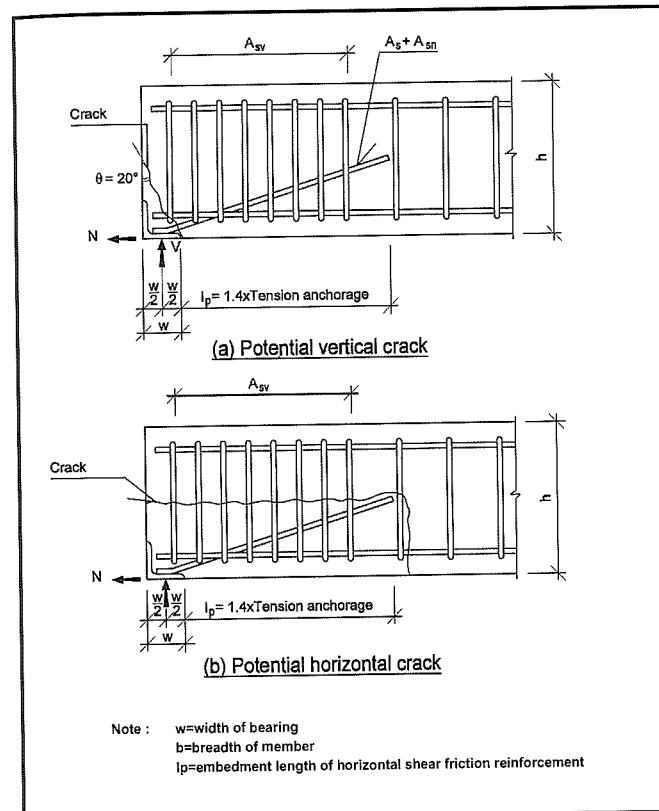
Shear Friction Reinforcement At Potential Cracks At Bearing Area
